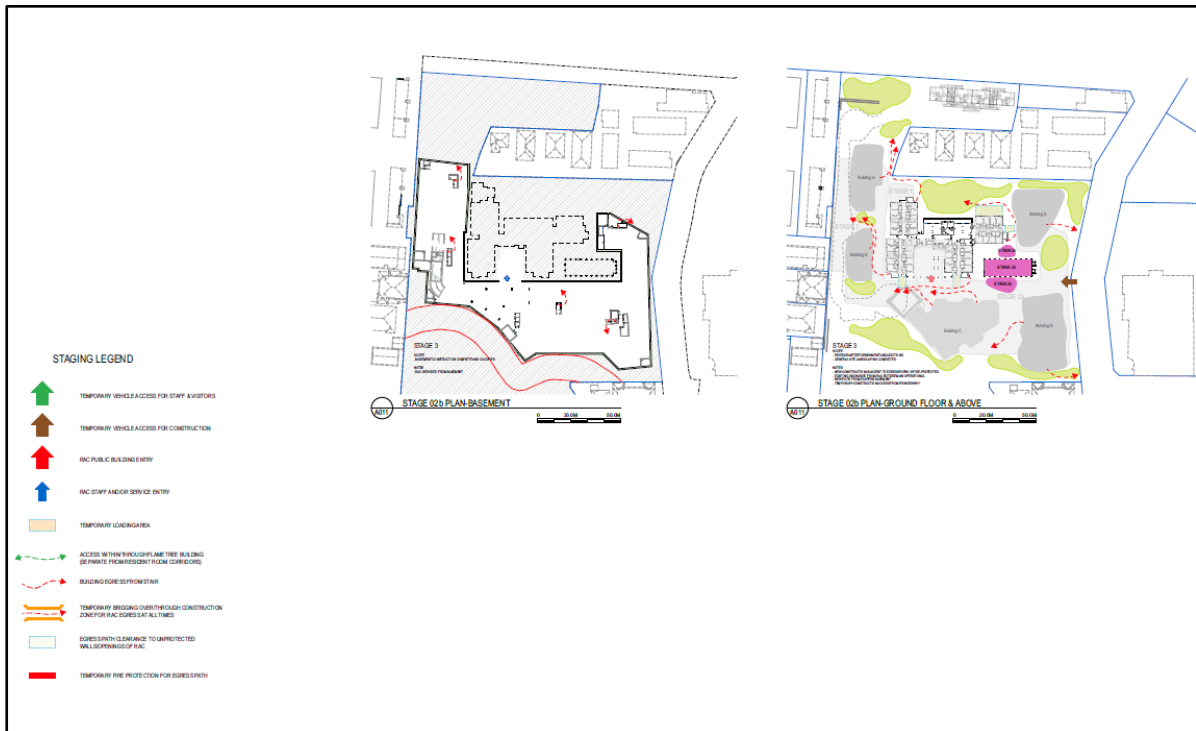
STAGING PLAN 02 (CALDERFLOWER)
